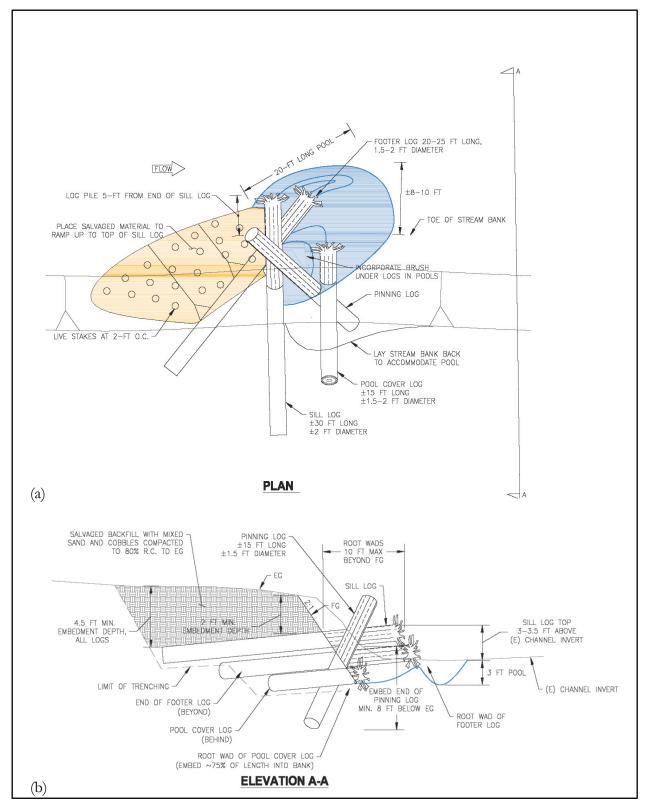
Design drawings for a Root Wad Alcove in (a) plan and (b) section.
